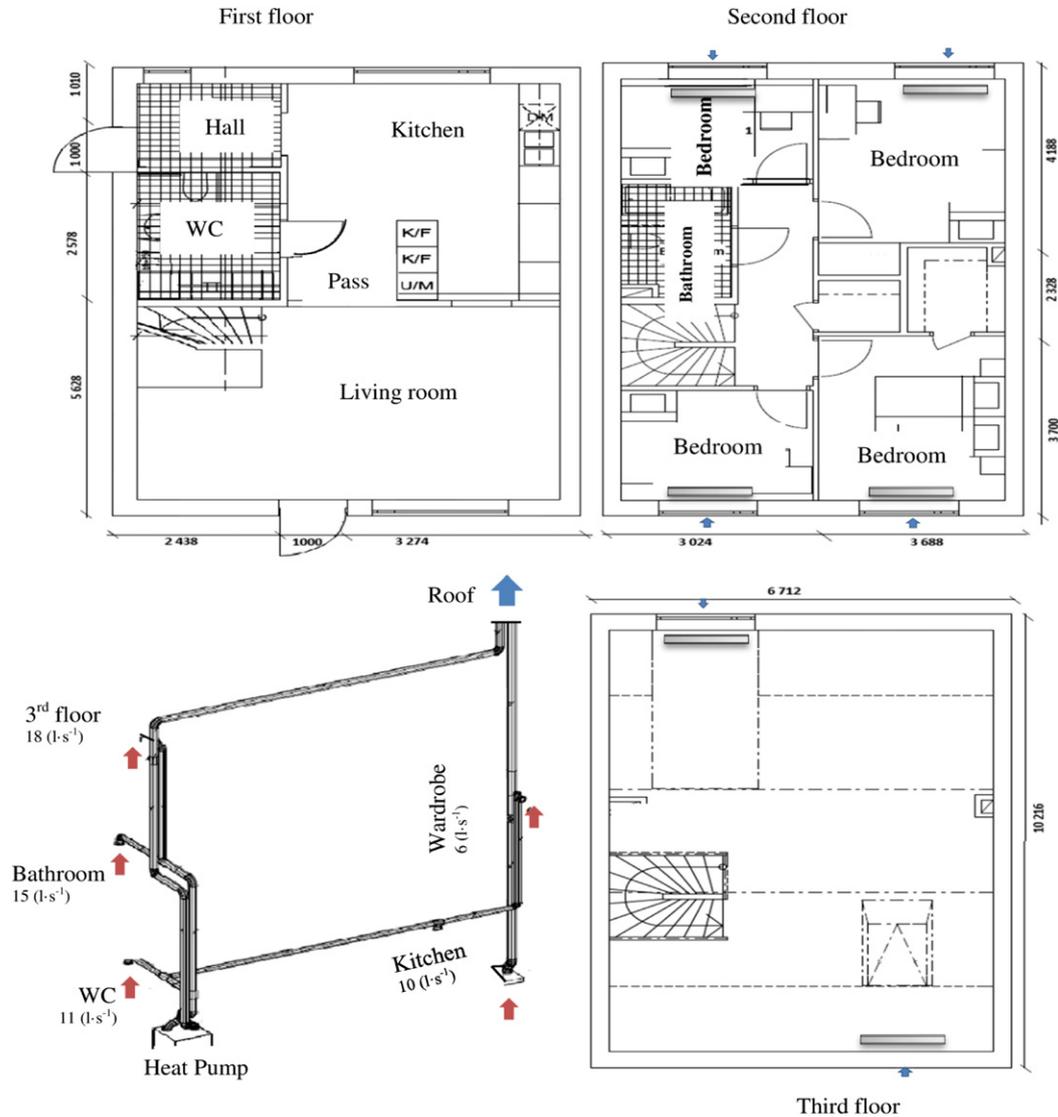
Floor plan showing the location of ventilation radiators in second and third floors and the ventilation system (values are in mm and plan is not to scale).
